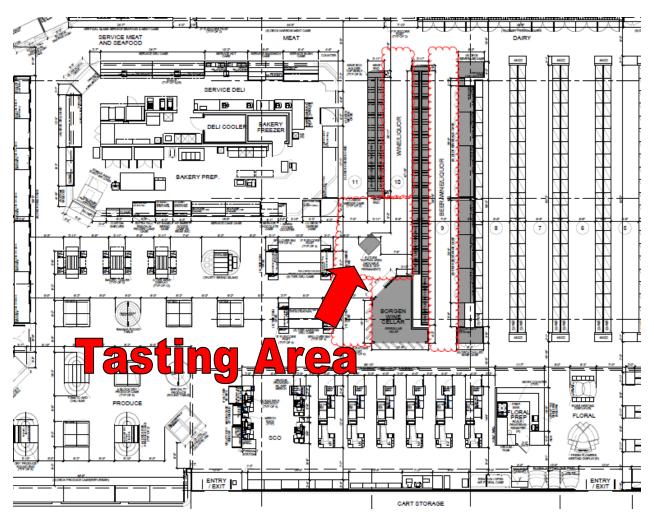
Floor Plan (Alcohol Sales Area Callout in Red)
